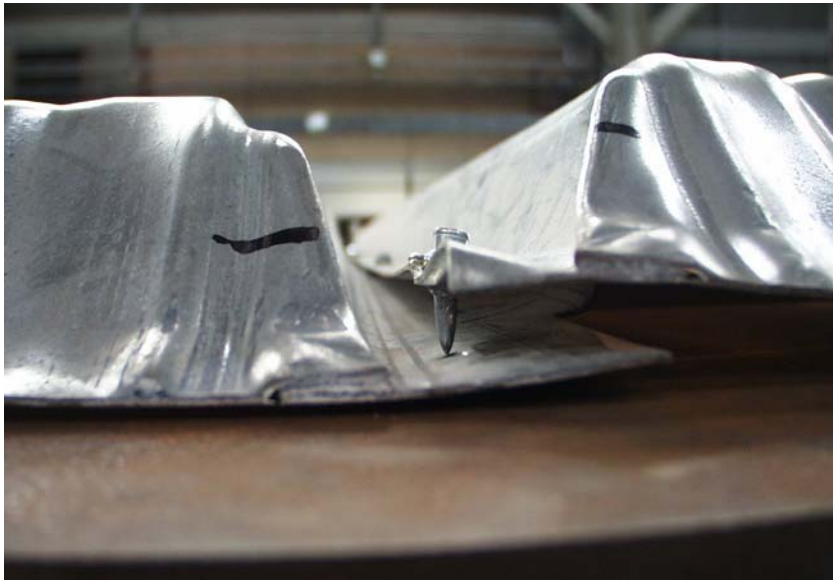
PULLOUT OF AN END FASTENER AT A LAP SEAM IN TEST M16-T3
